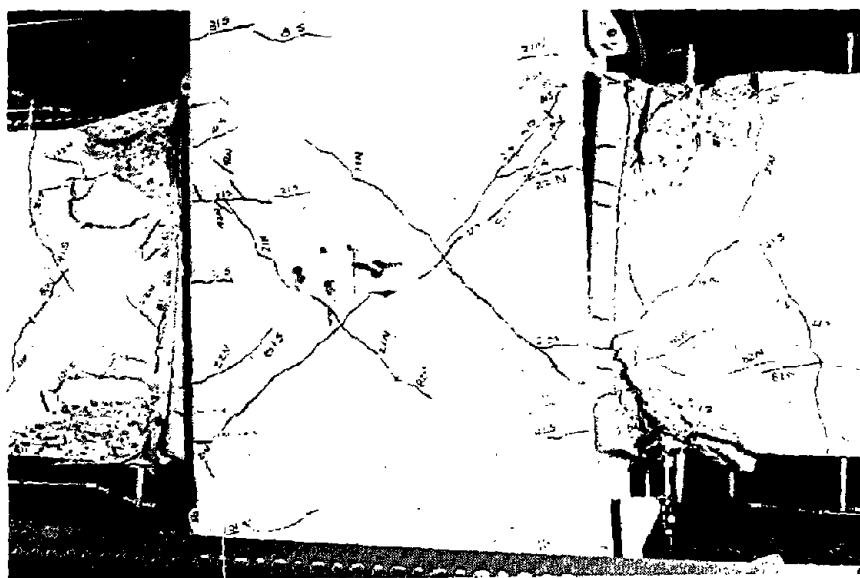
Specimen E-P-Z4 at failure - $12 \Delta_y$.
